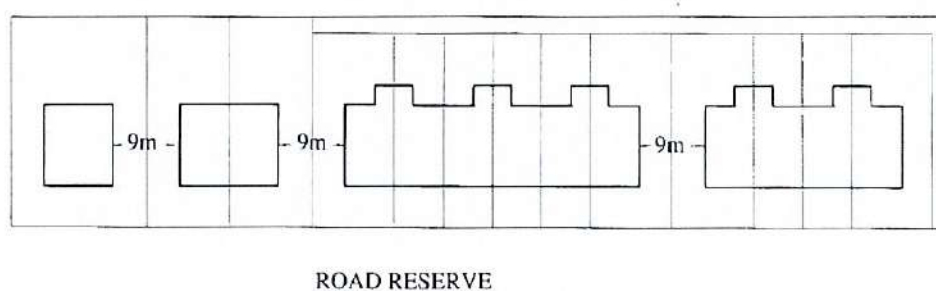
WIDTH OF A BLOCK OF BUILDING
